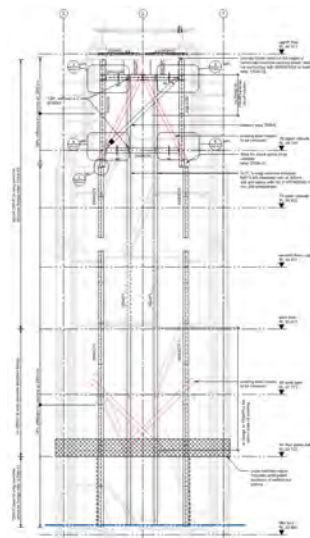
Top half of one face showing new VD moment frame (existing braces to be removed in red)
